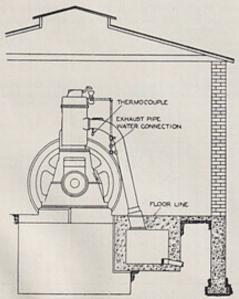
Individual Exhaust Pipe and Underground Conduit Arrangement (99YKA62)
